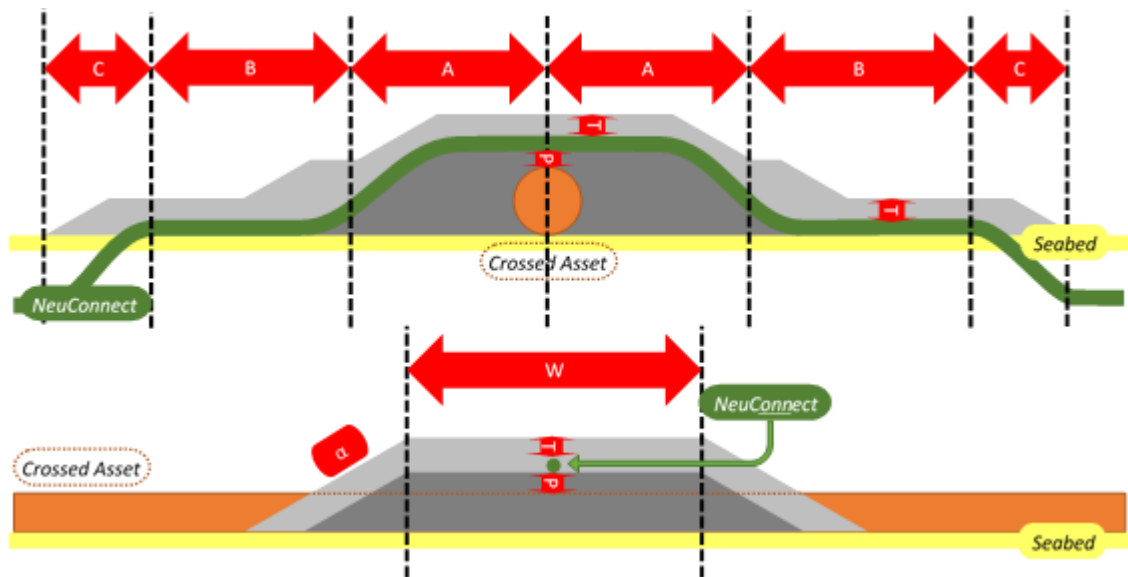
Definition of Proposed Dimensions Type D Crossing
